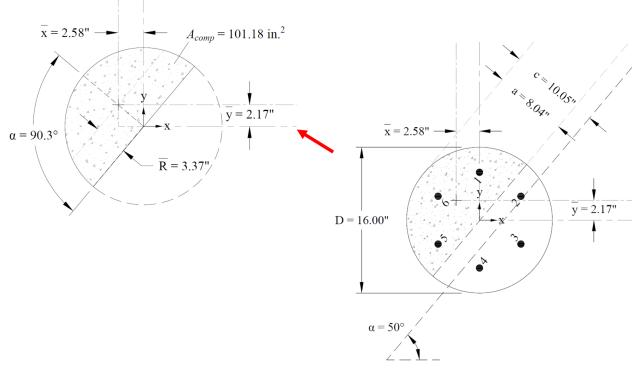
Cracked Concrete Column Section Centroid Calculations
